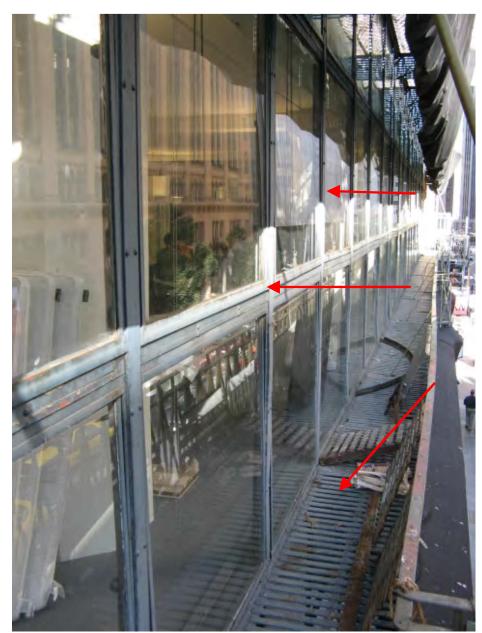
Hallidie Building, second story balcony. Red arrows denote the location of paint samples taken from mullion, window frame and balcony.
